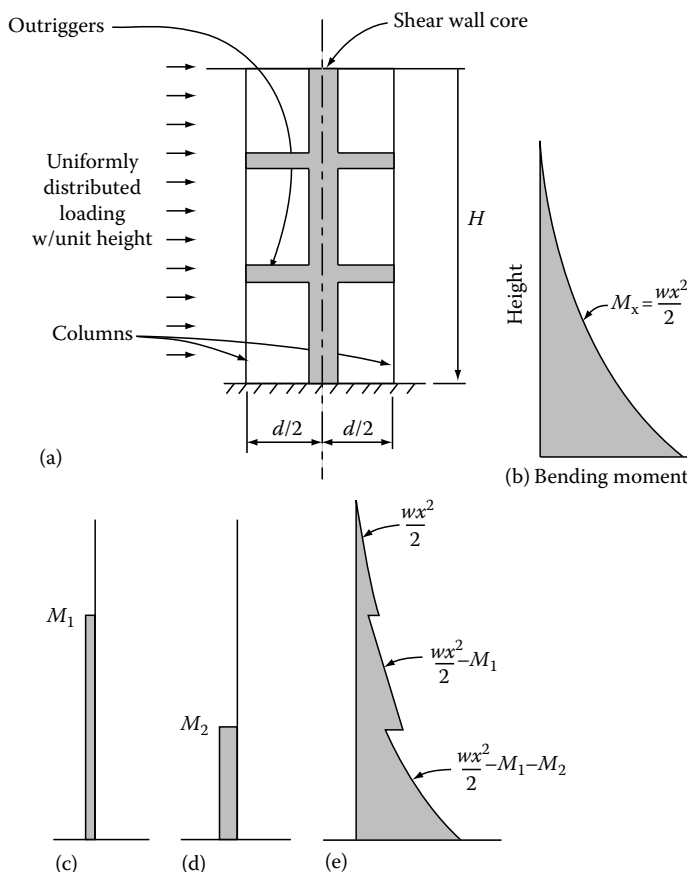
Analytical model of a building with outriggers and belt walls at two locations.
